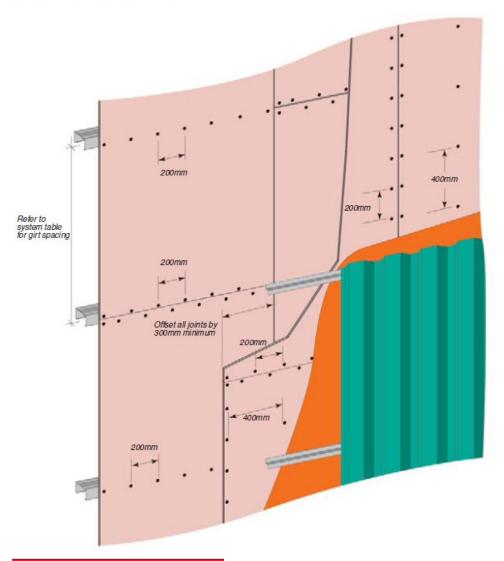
INSTALLATION DETAIL FOR STEEL FRAME EXTERNAL WALL SYSTEM – TWO OR THREE LAYER – VERTICAL SHEETING
